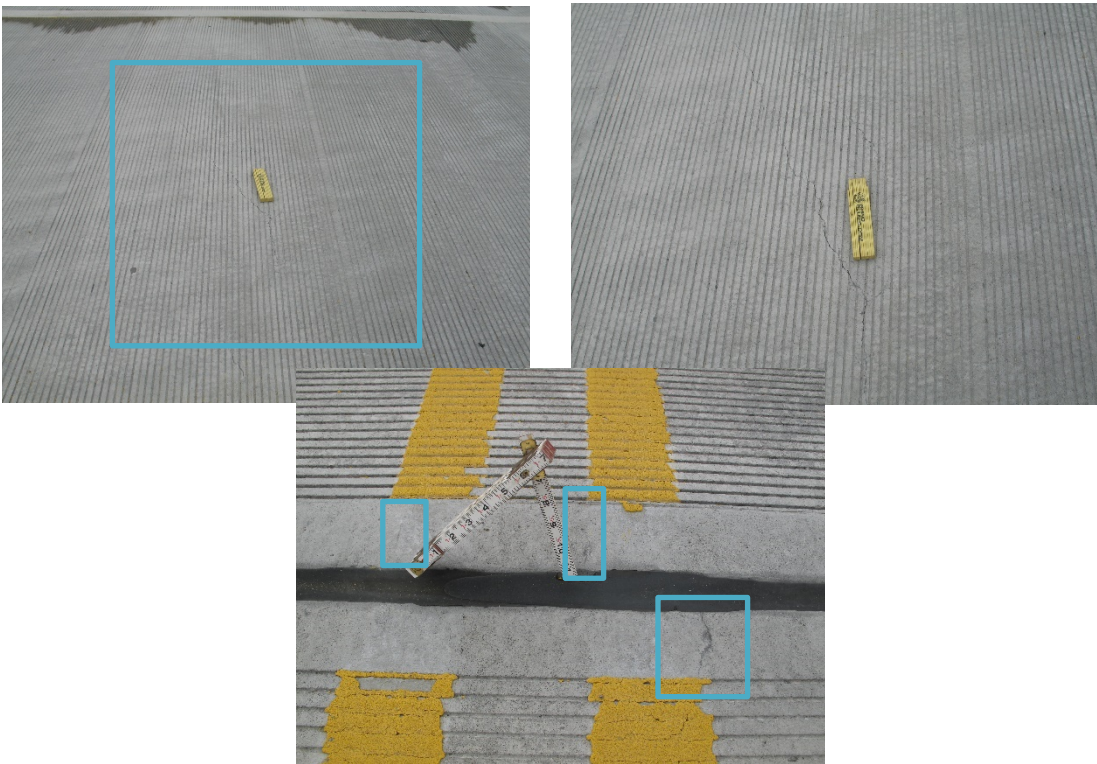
Ft Pulaski – Plastic Shrinkage Crack, Placement #1 Span 1
